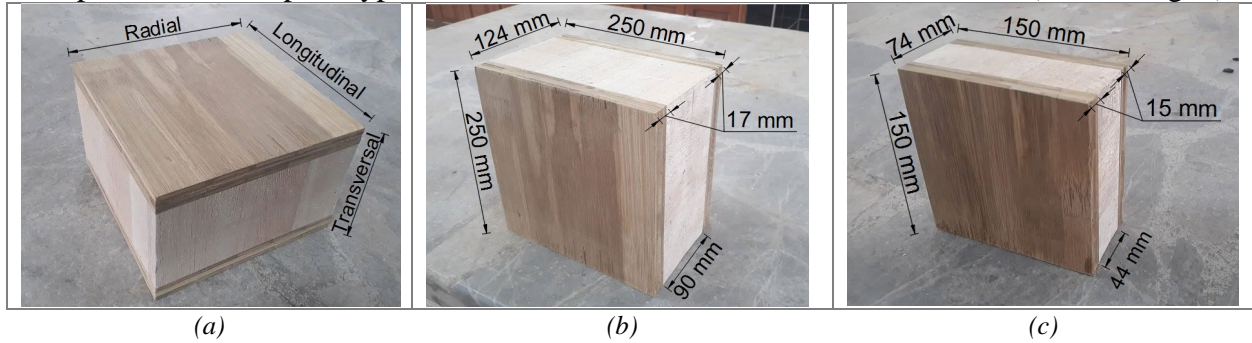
Bio-composite sandwich panel-samples for compression tests, a) loading directions, b) nominal panel-sample from prototype 1, and c) nominal panel-sample from prototype 2.
